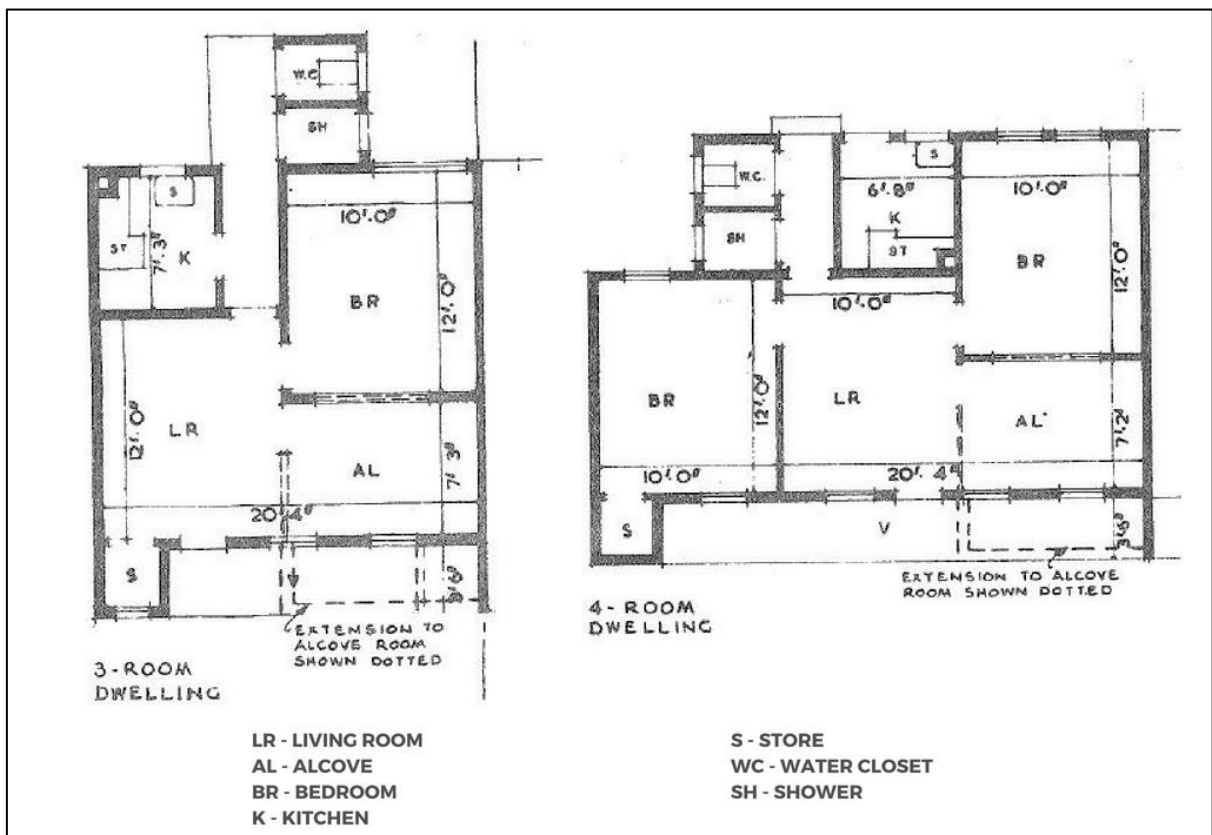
LEDB floor plans for three room and four room housing units; source: The Overseas Building Notes (1958, p.53/23).
